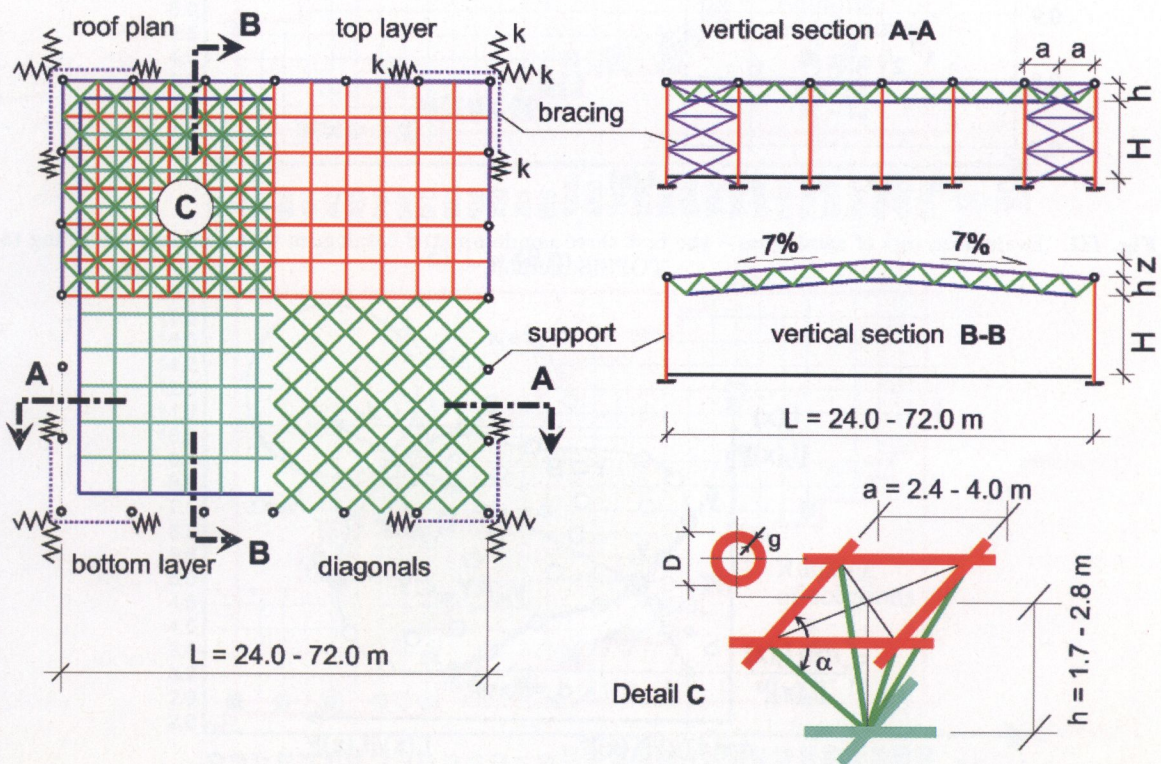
Fig. II. Layout of steel halls and spatial trusses used for roof coverings
